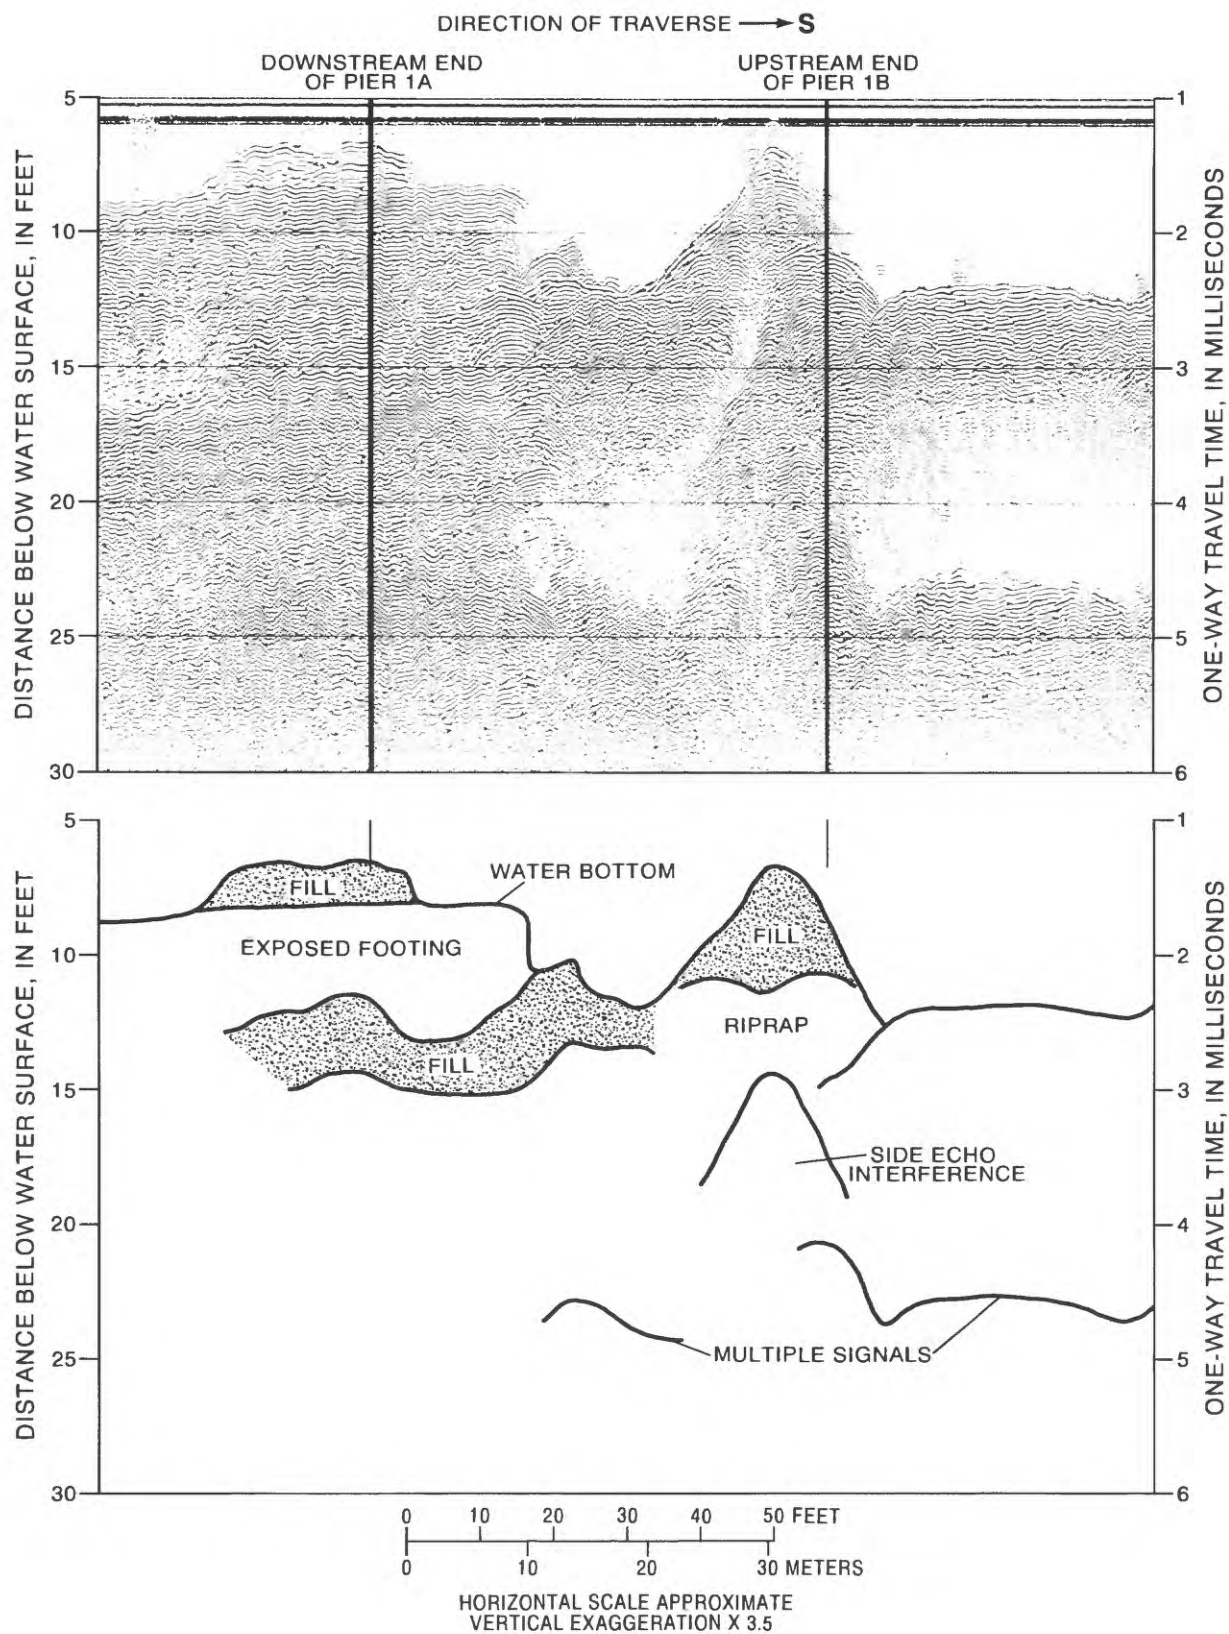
A 14-kilohertz tuned-transducer record and interpretation of a lateral run 5 feet west of pier 1 of bridge 332C at the Deschutes River near Biggs, Oregon.
